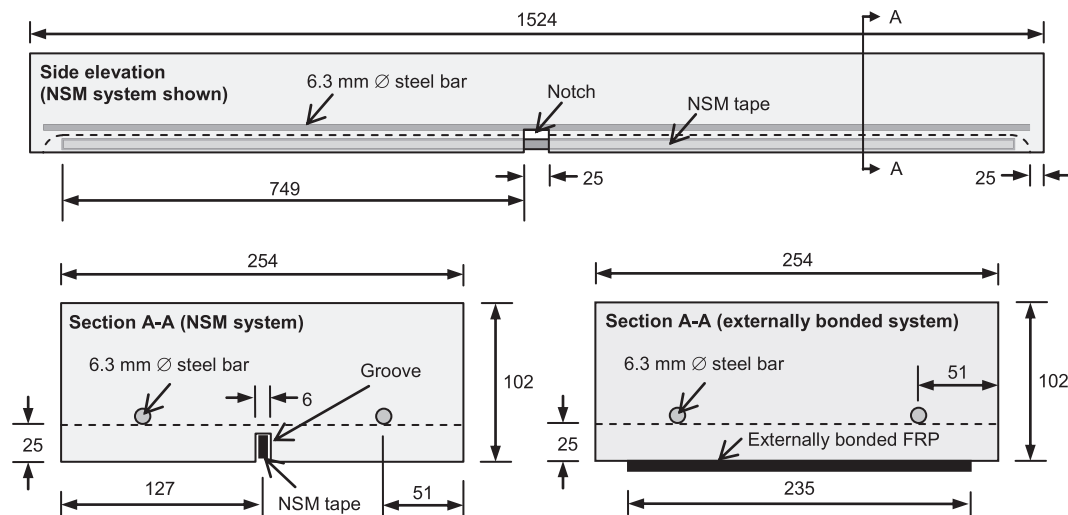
NSM and externally bonded FRP strengthened reinforced concrete beams (all dimensions are in mm).
